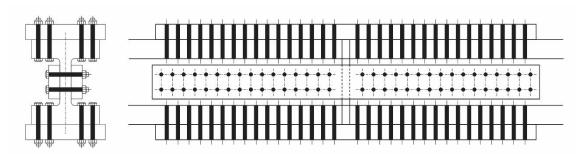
Bolted connection required to transfer large truss loads.[32]
